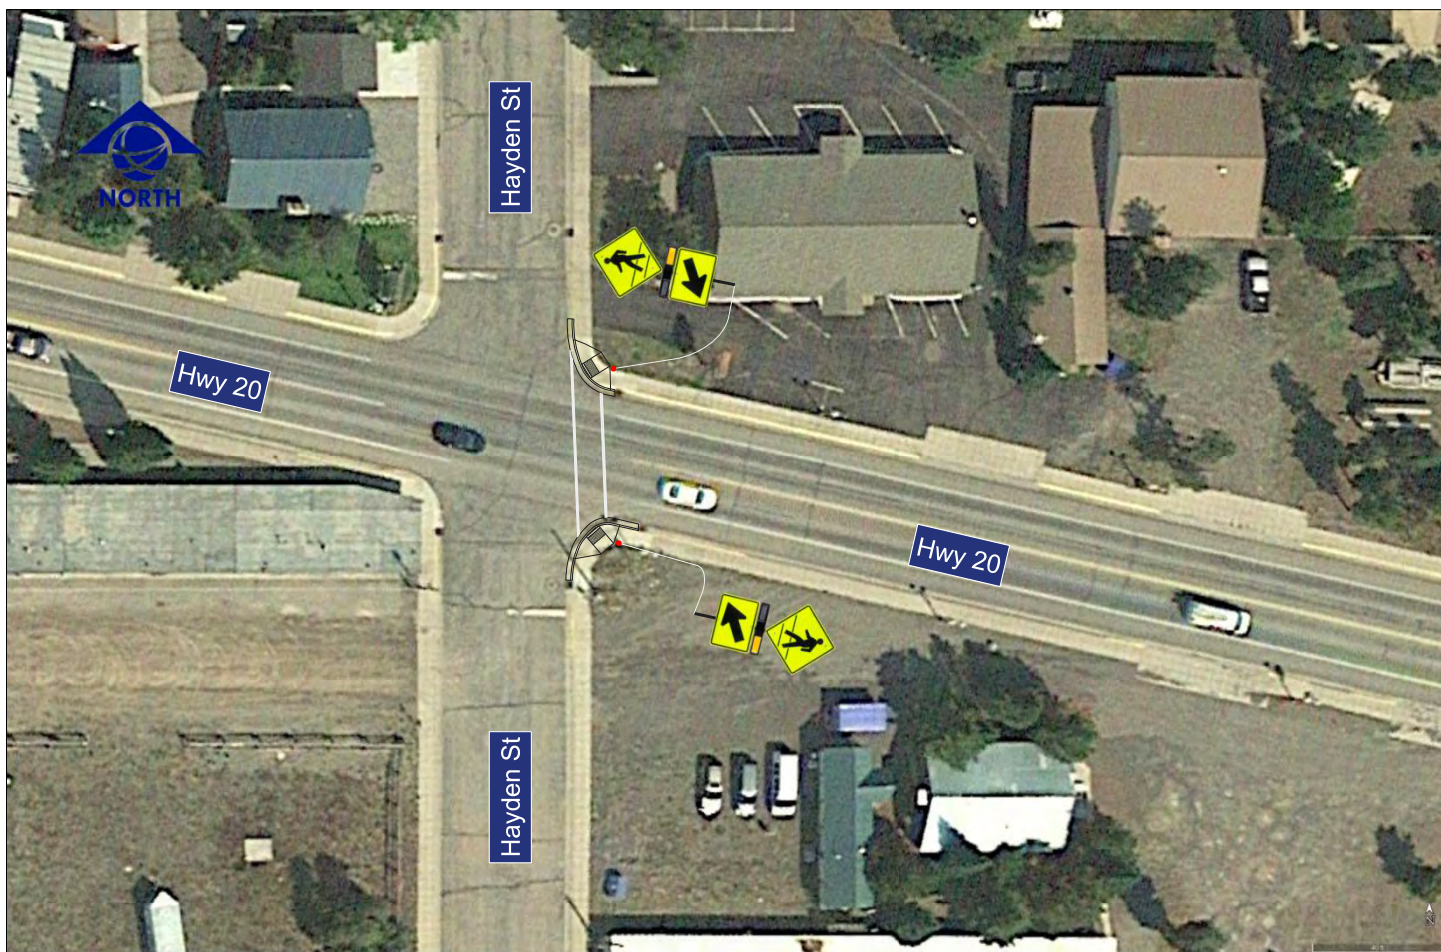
Concept design of crosswalk with Rapid Rectangular Flashing Beacon at Highway 20 and Hayden Street
